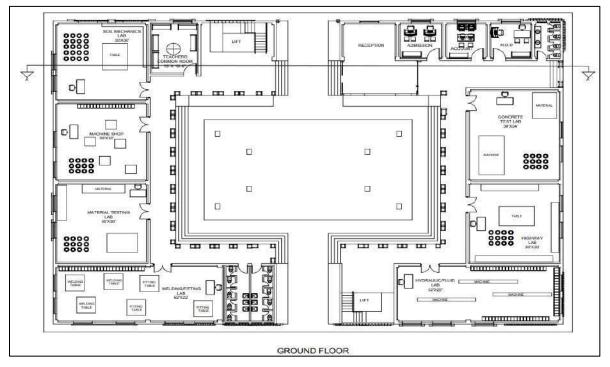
University building top view - Ground floor (AutoCad 2022)
